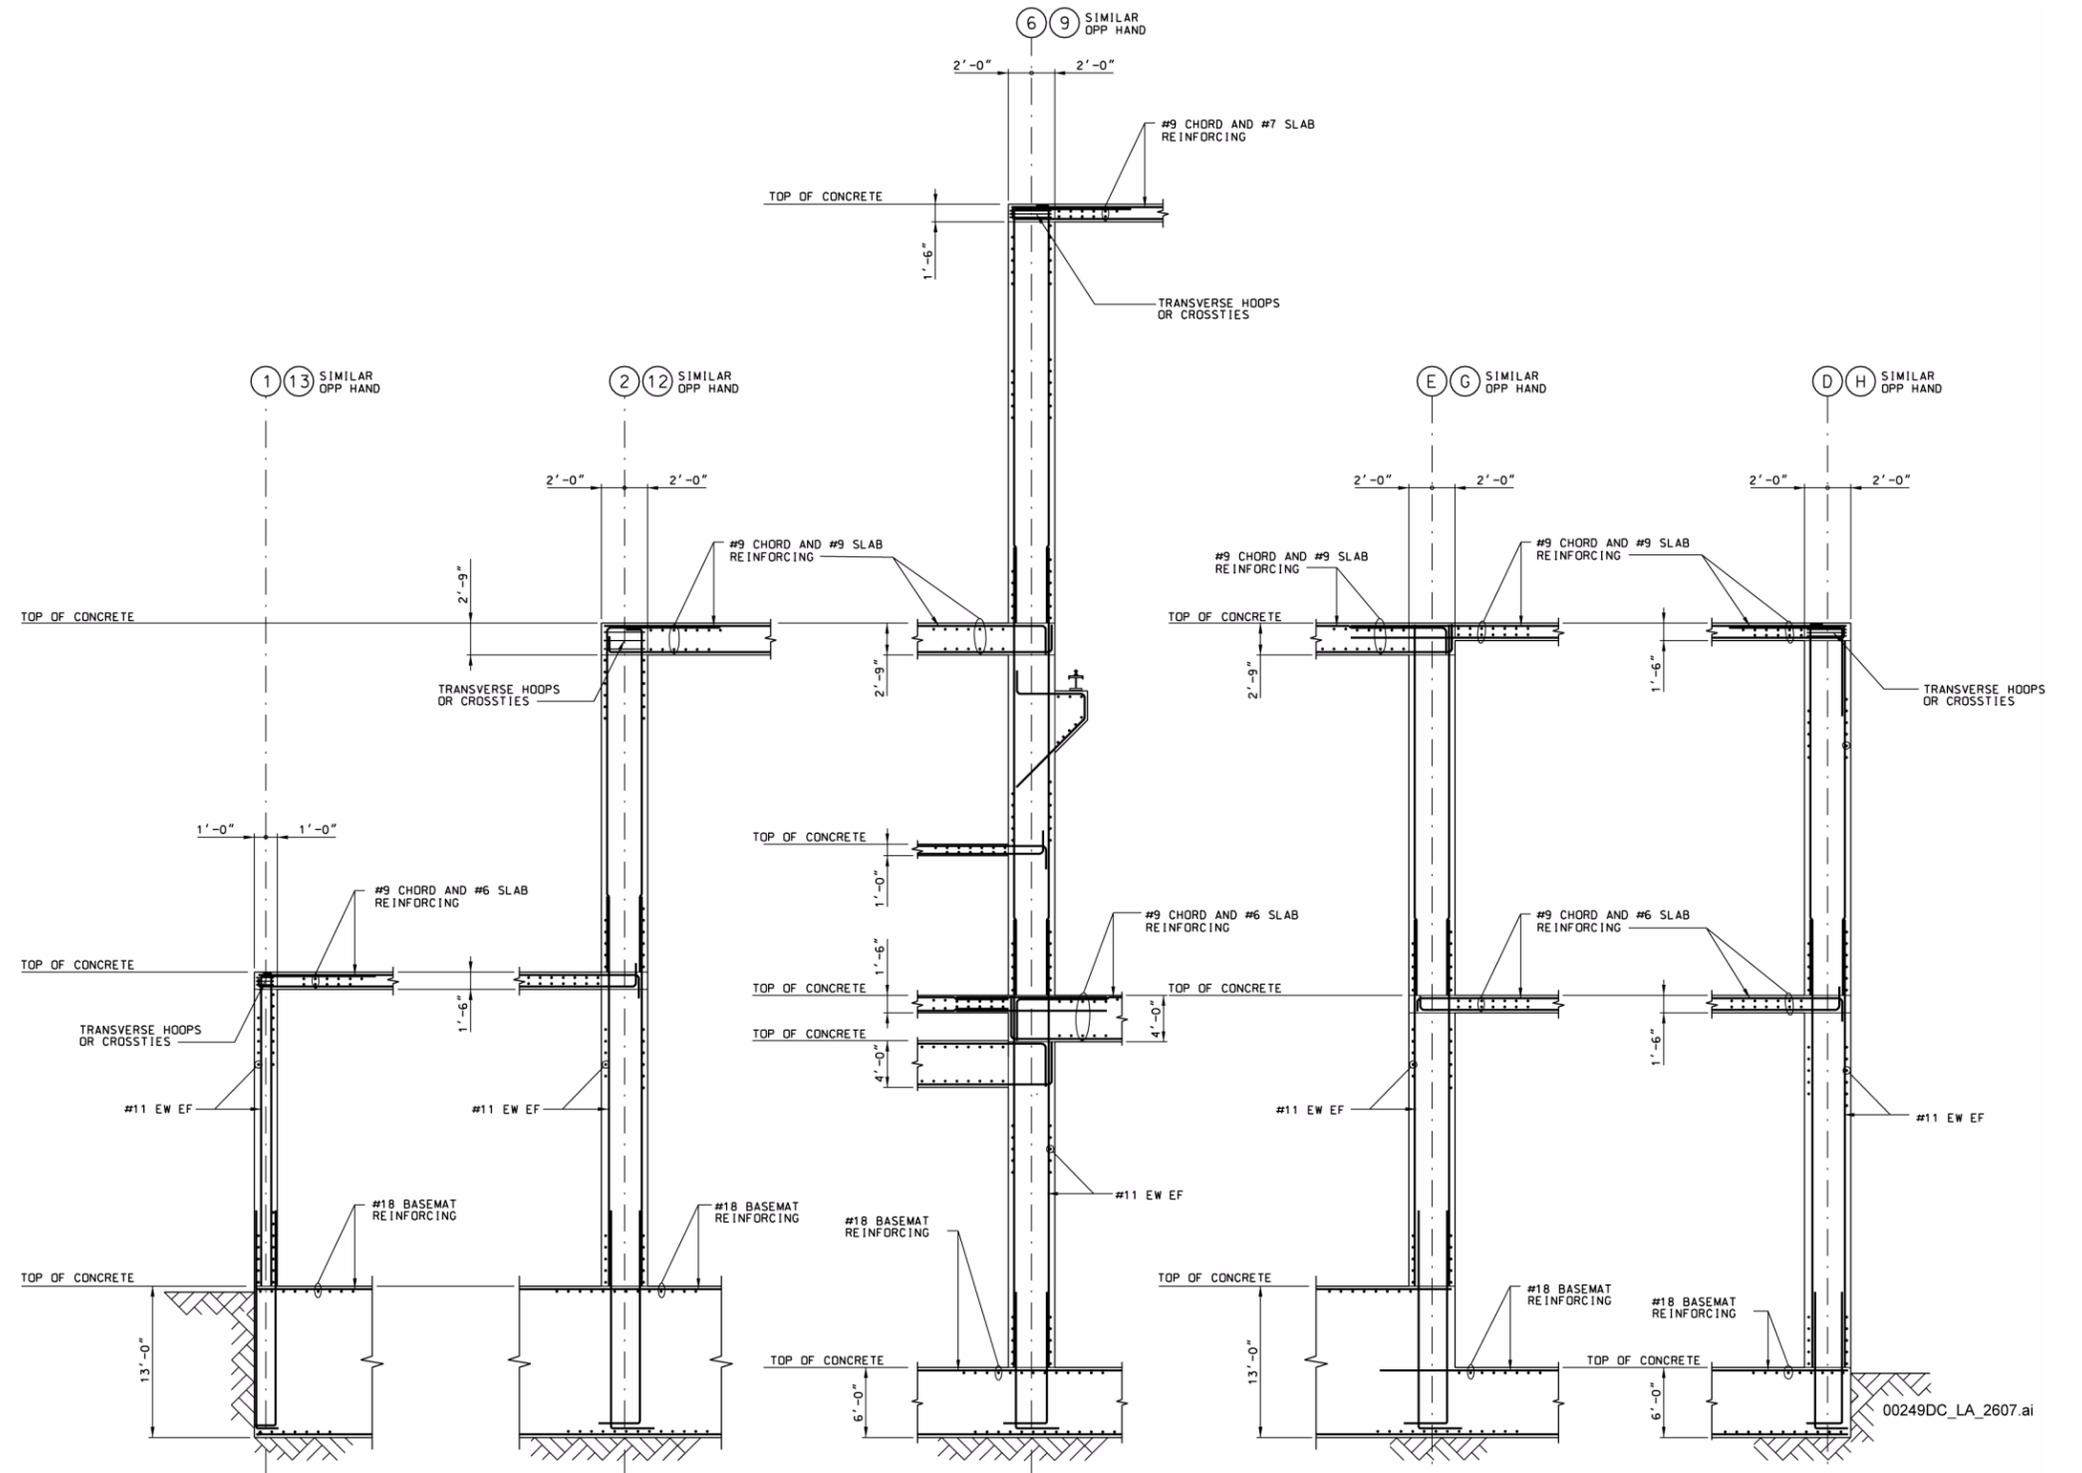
Typical Canister Receipt and Closure Facility Reinforcing Sections
